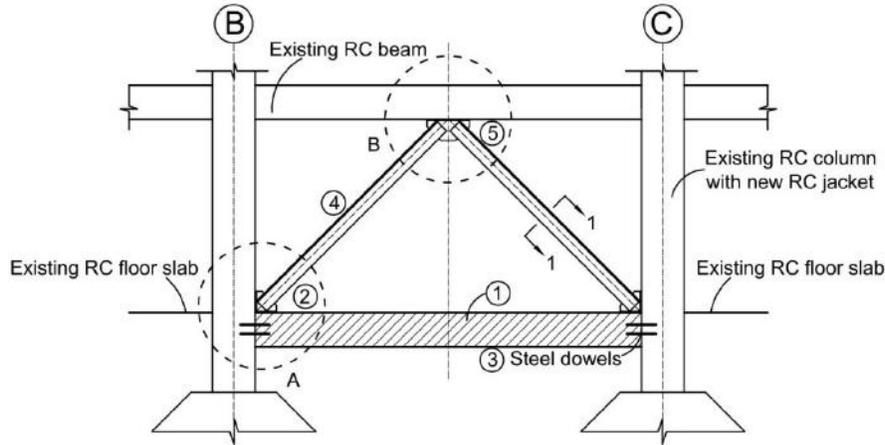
Example of added steel bracing in an existing RC frame: 1–new RC tie-beam; 2 – new steel gusset plate for the brace-to-column connection; 3 – steel dowels for brace-to-tie-beam connections (various locations); 4 – new double-angle steel braces; 5 – new steel gusset plate for the brace-to-beam connection.
